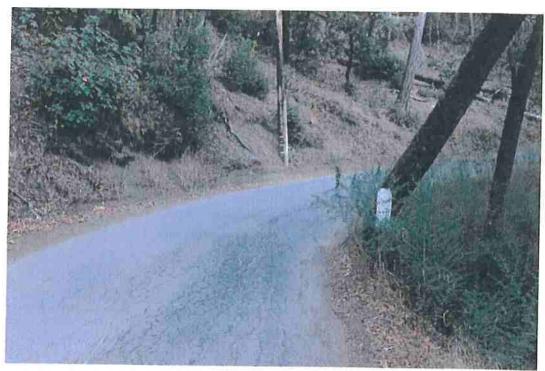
Mile 2.15: Pinch point at tree, 15-ft road width, 1-ft shoulder.
